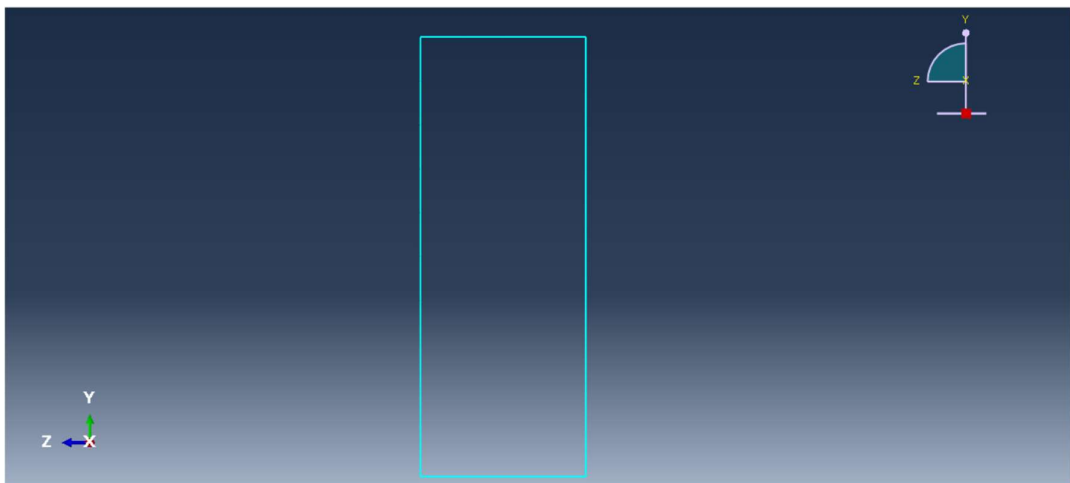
Meshing of stirrups reinforcement steel for flexure beam model
